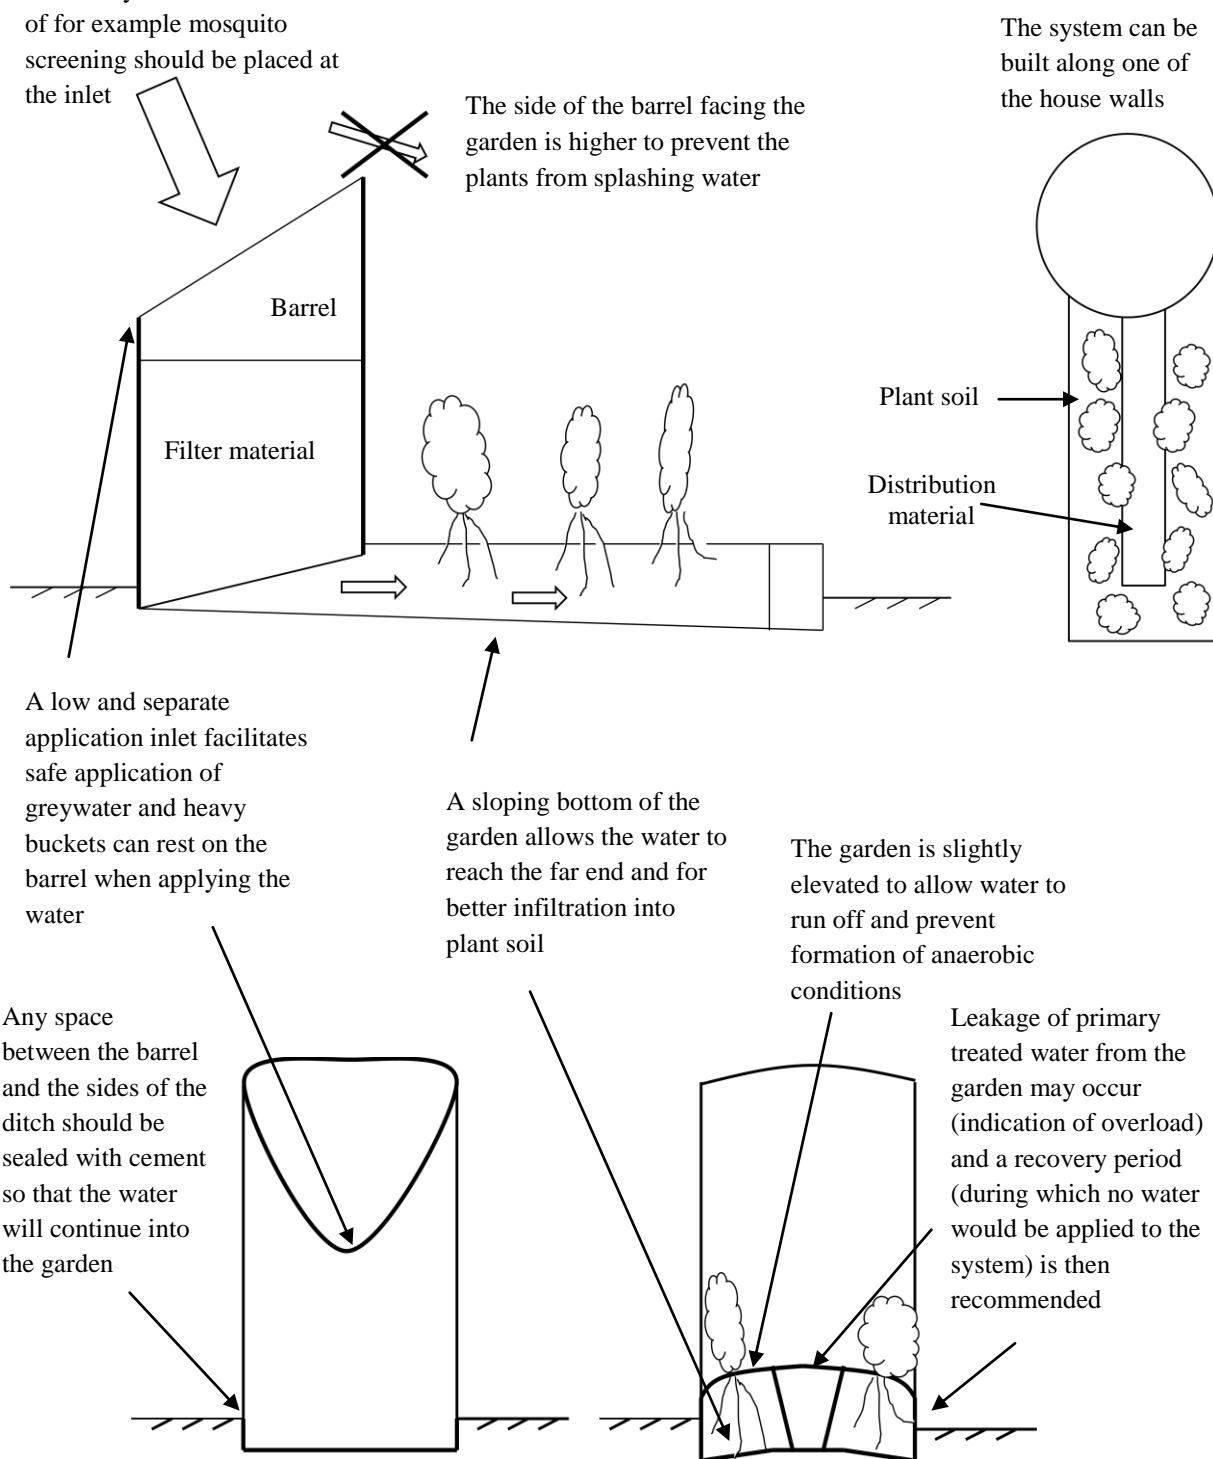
Side and top view of filter garden design, where a filter is connected to a horizontal flow garden (author's figure).
